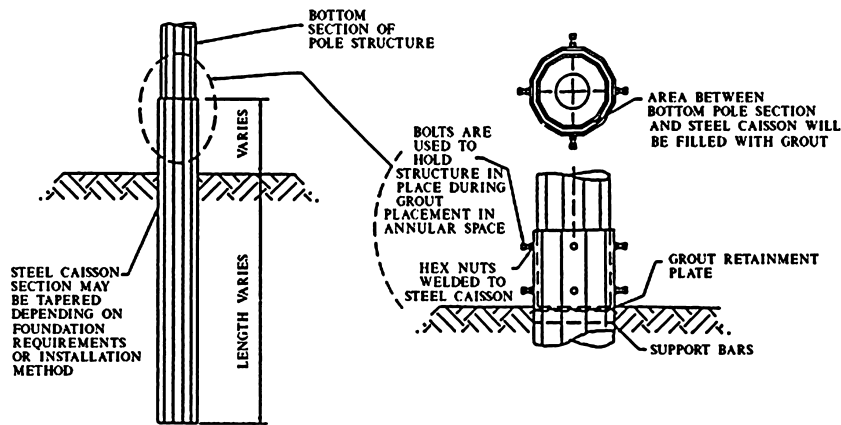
EMBEDDED CASING FOUNDATION.
